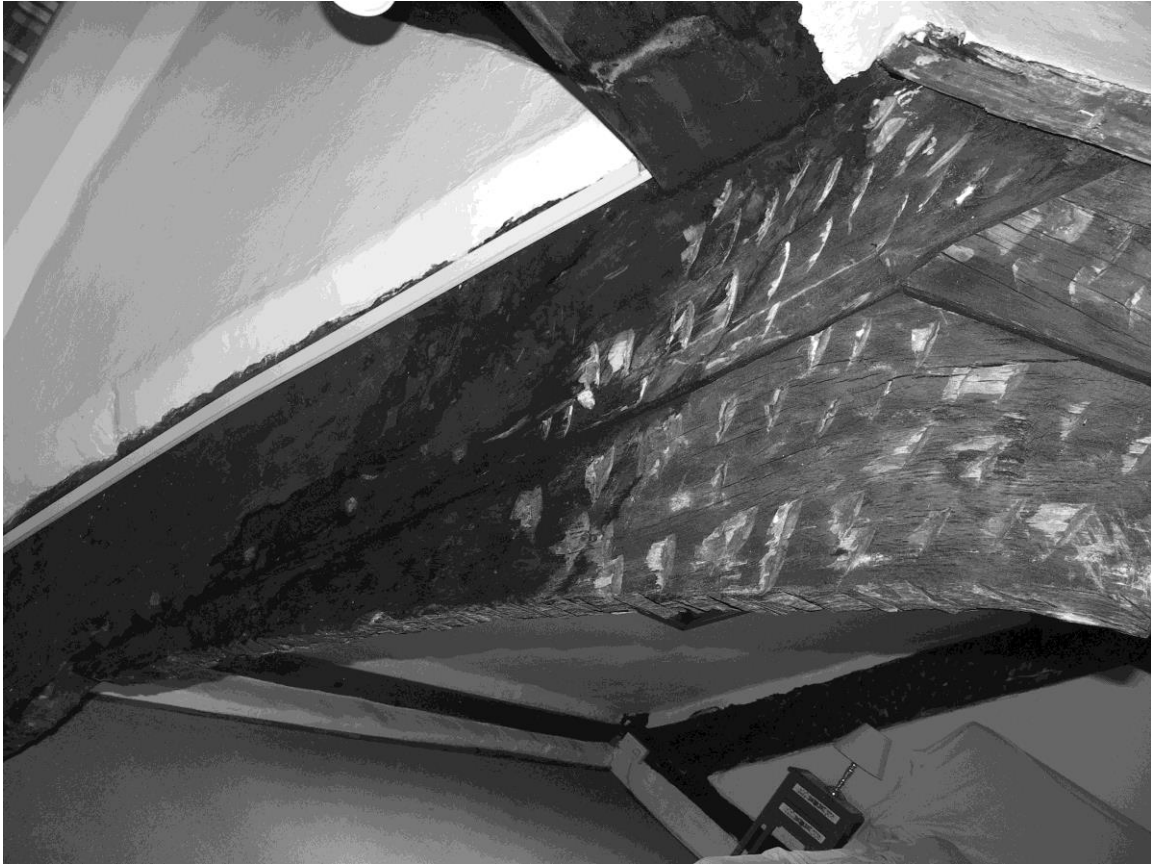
Back of open cruck blade showing joinery detail; adze marks to take plaster
